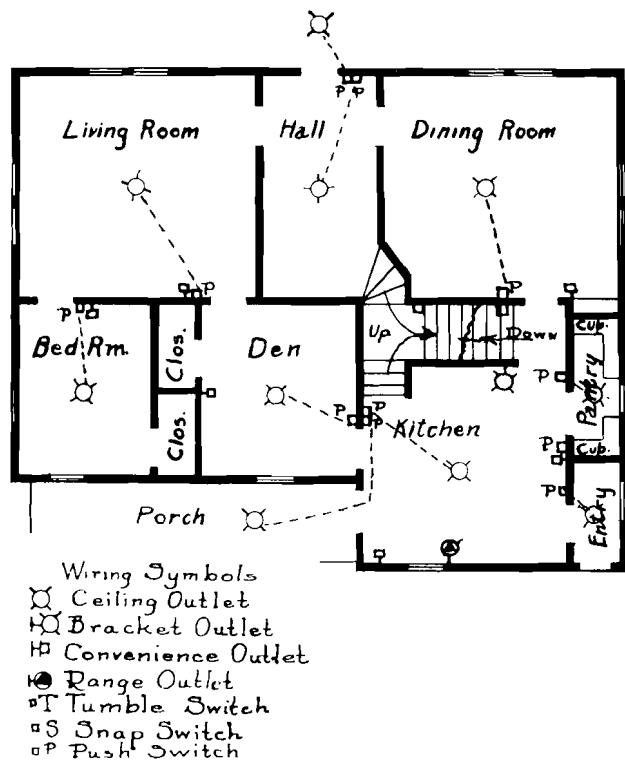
Original wiring installation at the home of H. E. and W. H. Nelson, showing location of lights, switches, and outlets on first floor. All lights controlled by wall switches.
